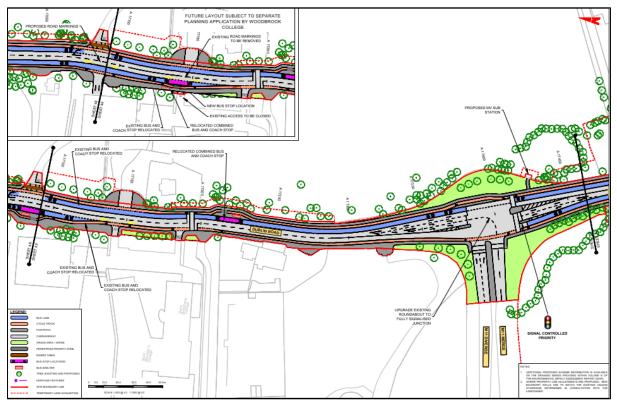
Extract from General Arrangement Drawing at Dublin Road / Old Connaught Avenue junction (Sheet 49)
